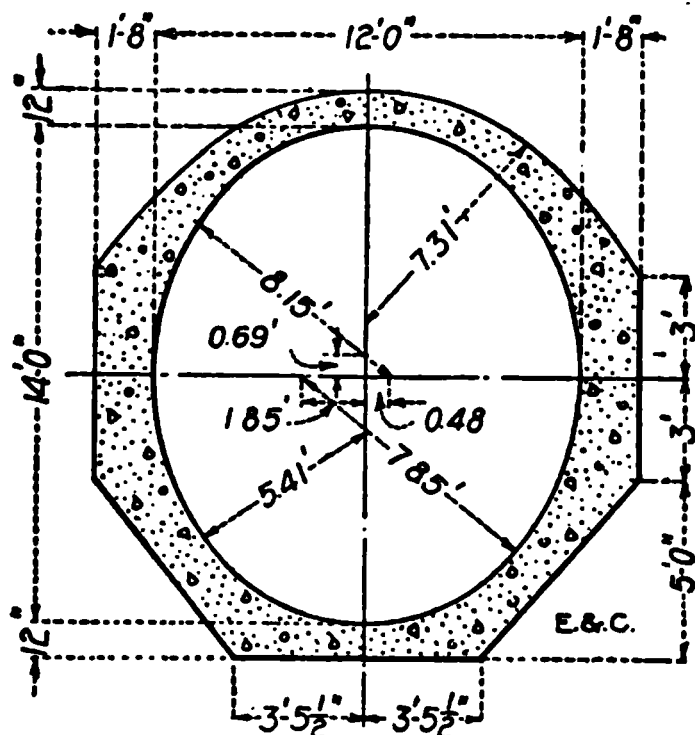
Cross section of plain concrete portion of the new West 39th St. conduit, Chicago, Ill.
